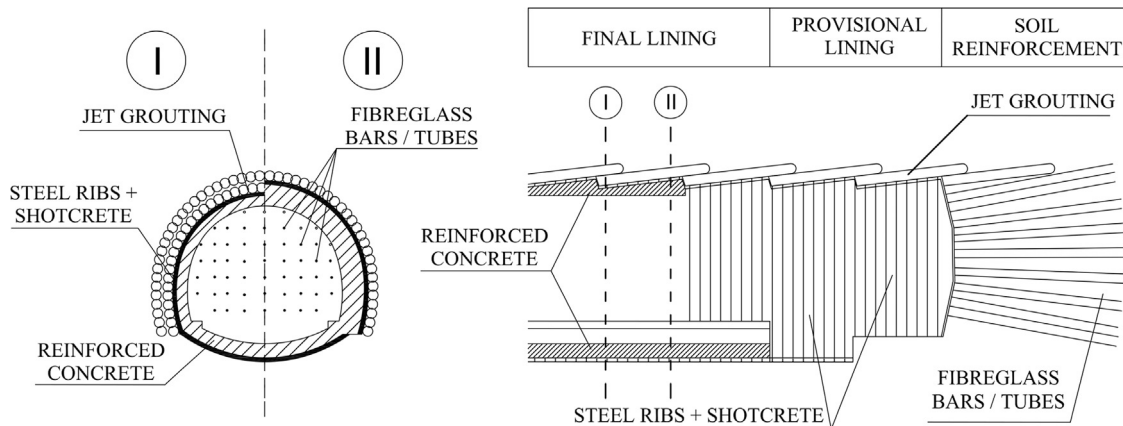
Typical construction sequence of full face excavation with jet grouted canopy.
